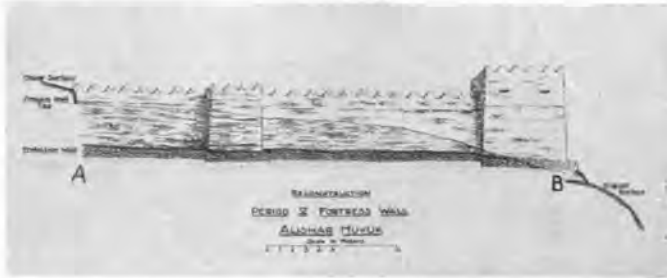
Reconstruction of wall on Mound D. Scale, 1:600
